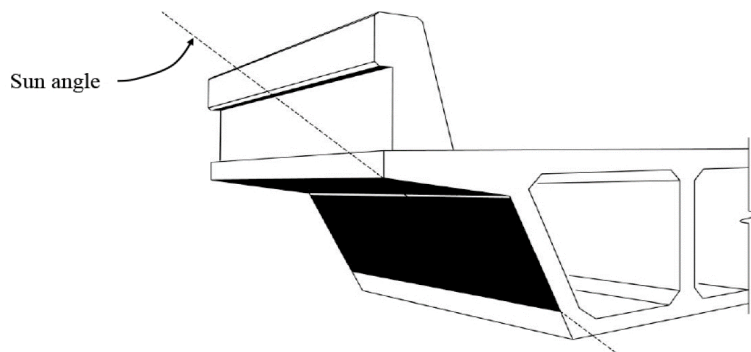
Typical Shadow on Sloped Box Girder
